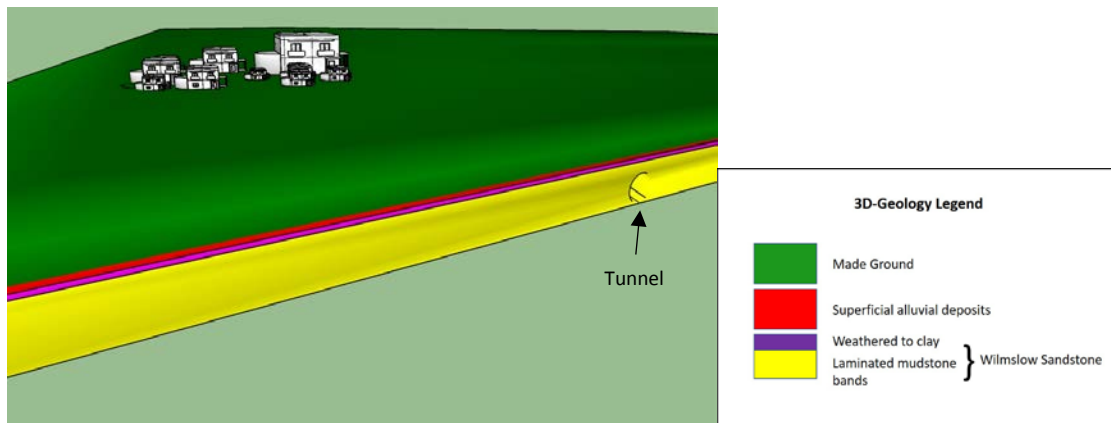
3D buildings-subsurface-tunnel objects views in BIM.
